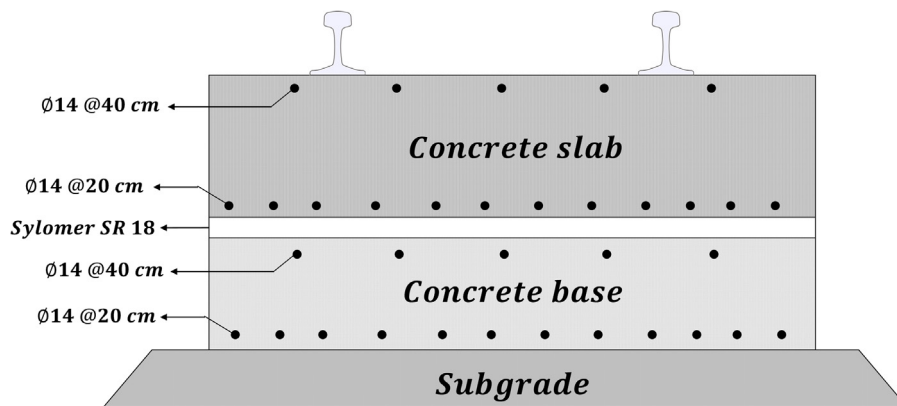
A schematic cross section view of slab track in Isfahan subway.
